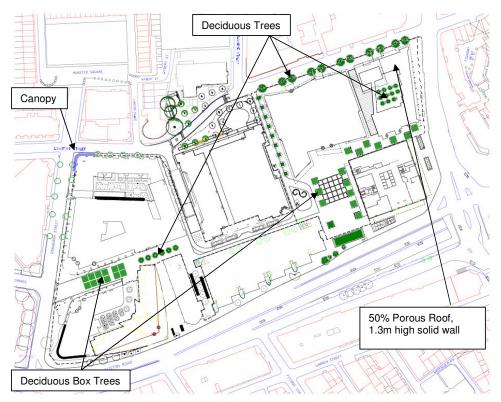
Site Plan of the Development, with tested wind mitigation measures.
